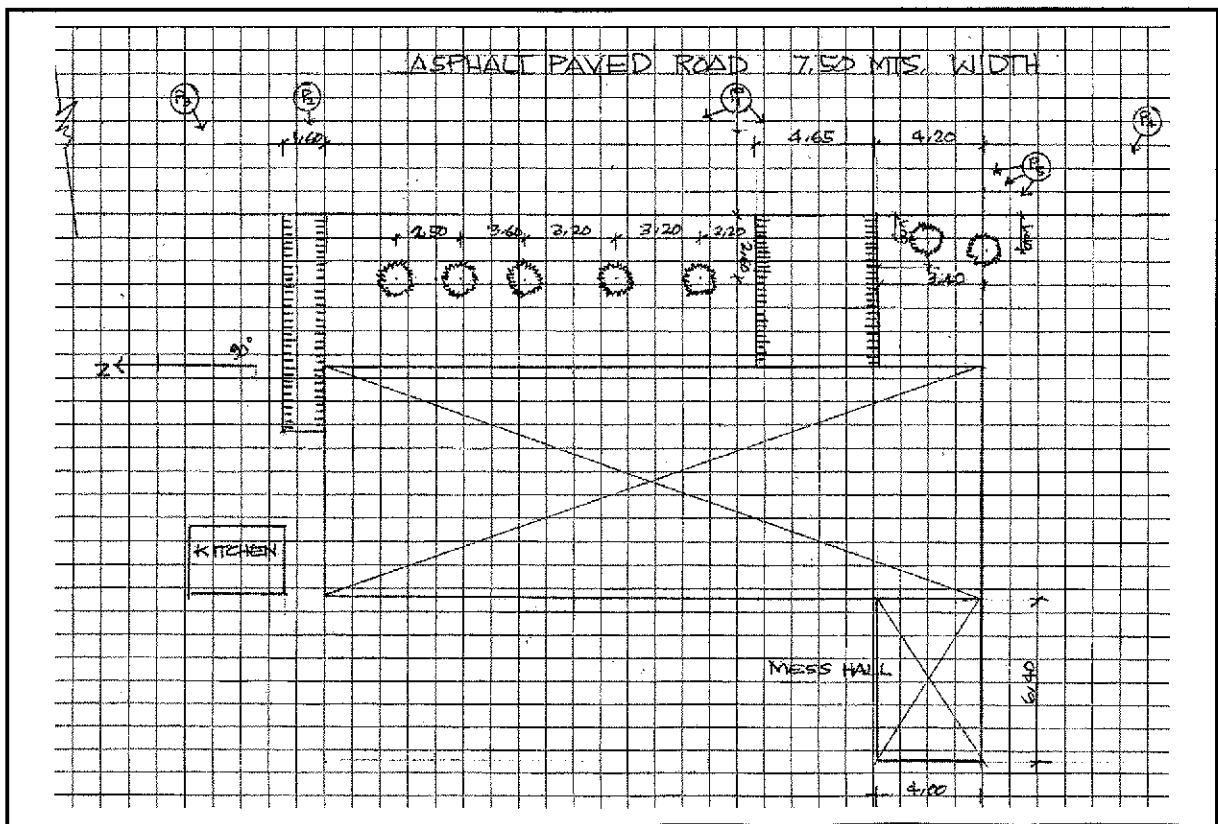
SITE LAYOUT FOR CGS TACLOBAN
